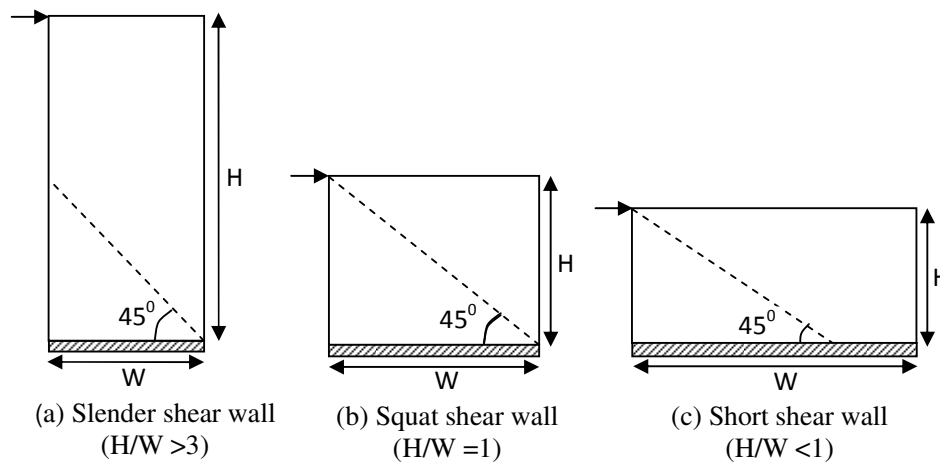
Orientation of diagonal cracks in the shear wall
